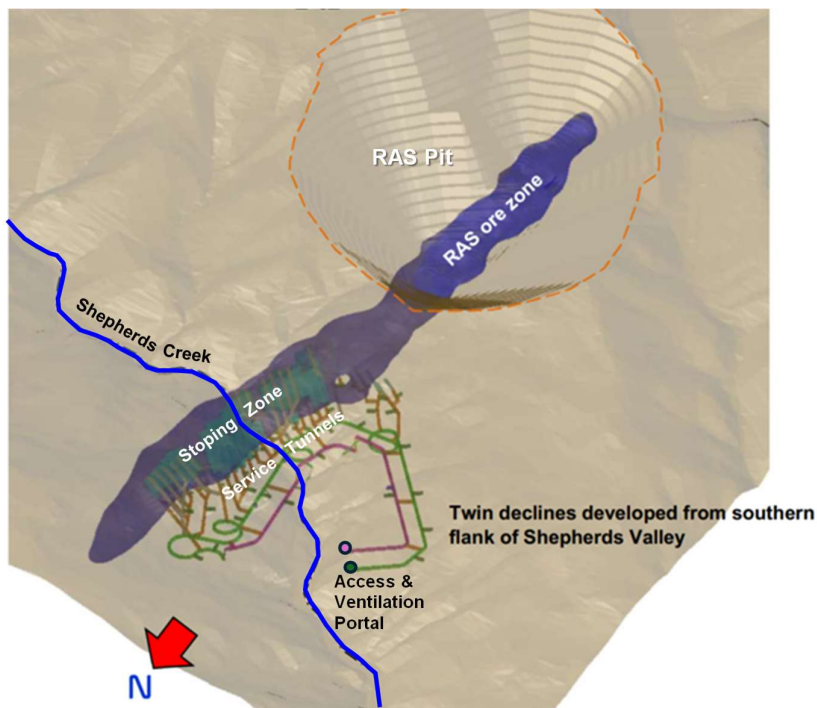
Schematic of RAS Pit, RAS underground workings and Shepherds Creek (from document B.28)
